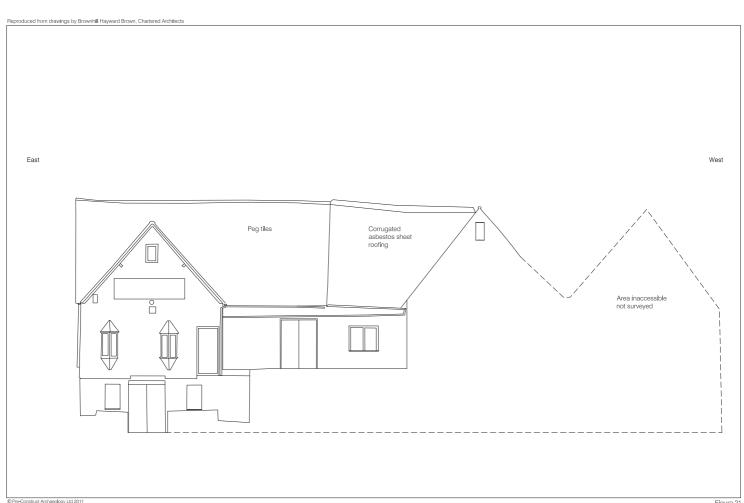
North elevation of Maltings (Buildings 5 and 7) Musgrove Maltings, Baldock Not to scale at A3
